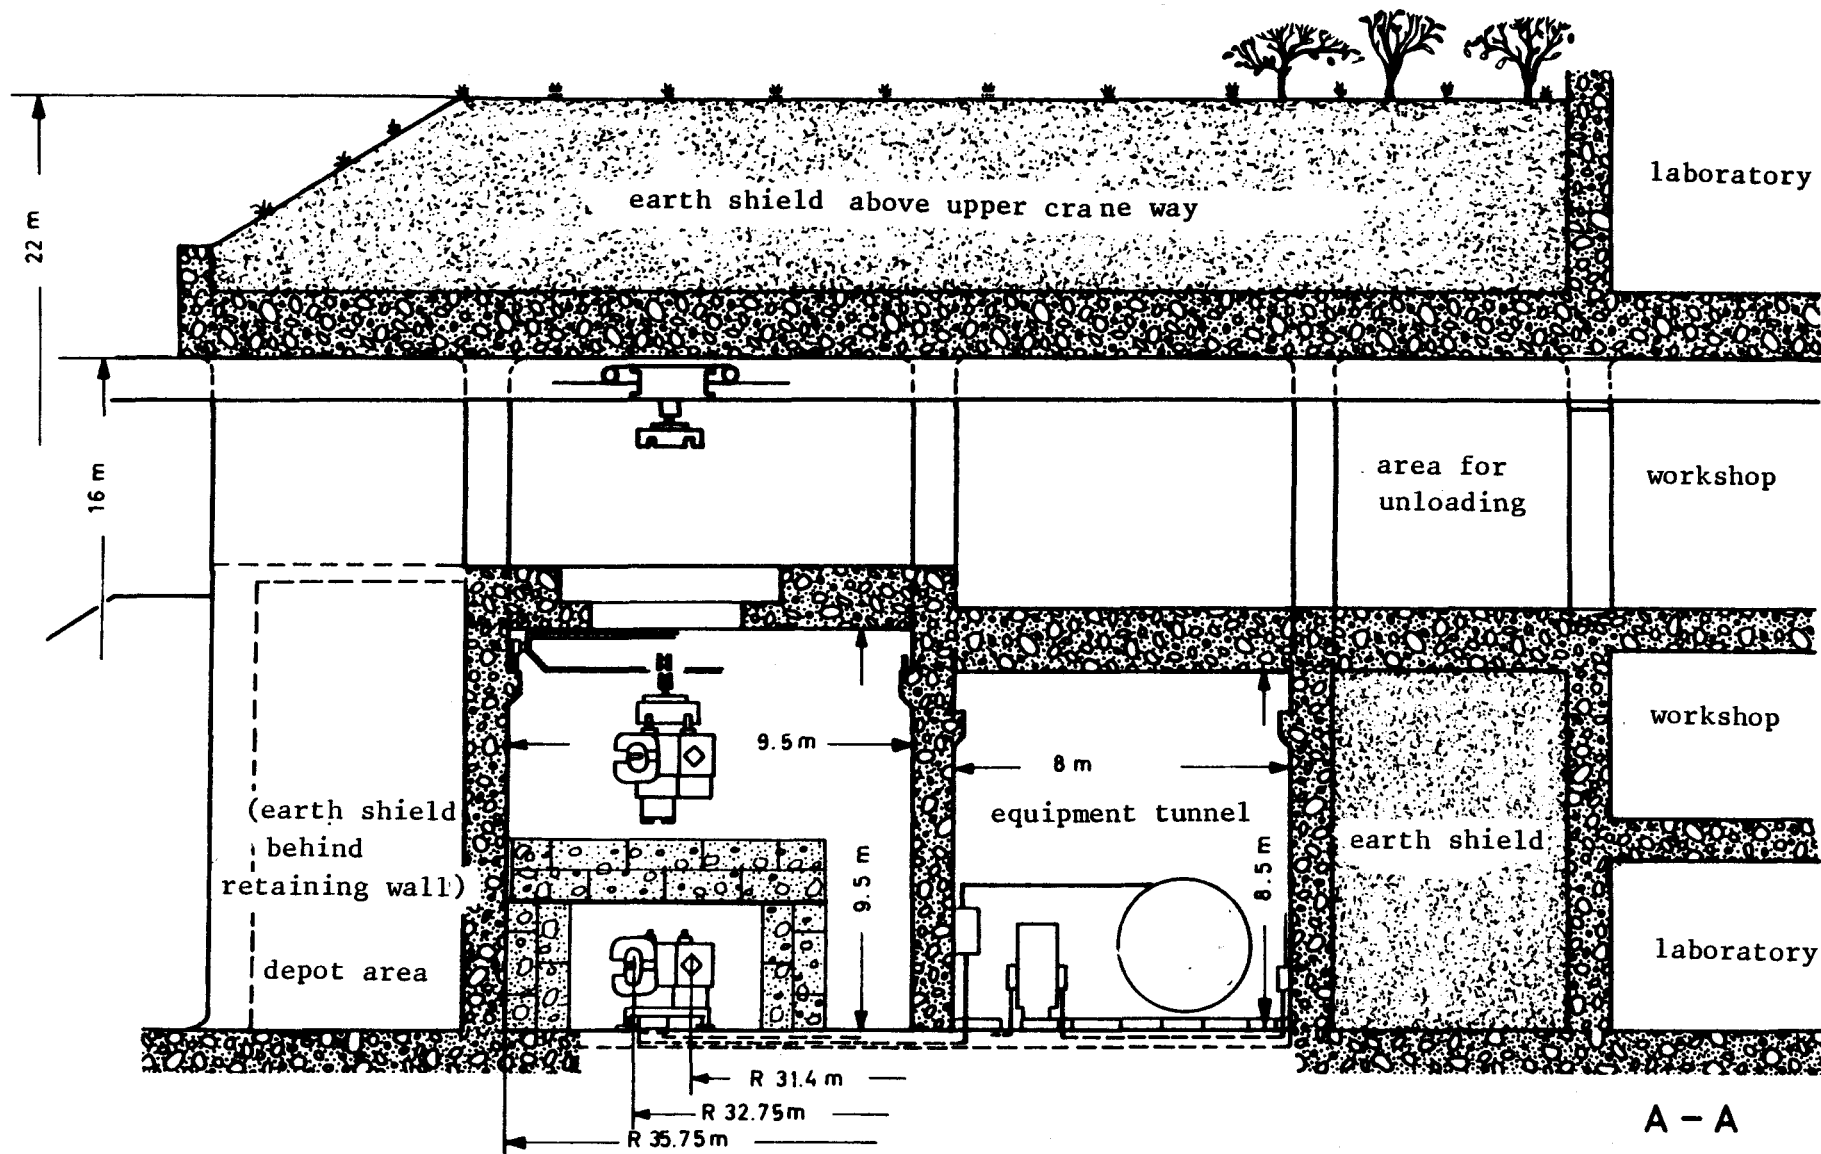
Section through the IKOR ring tunnel and equipment tunnel with shielding.
